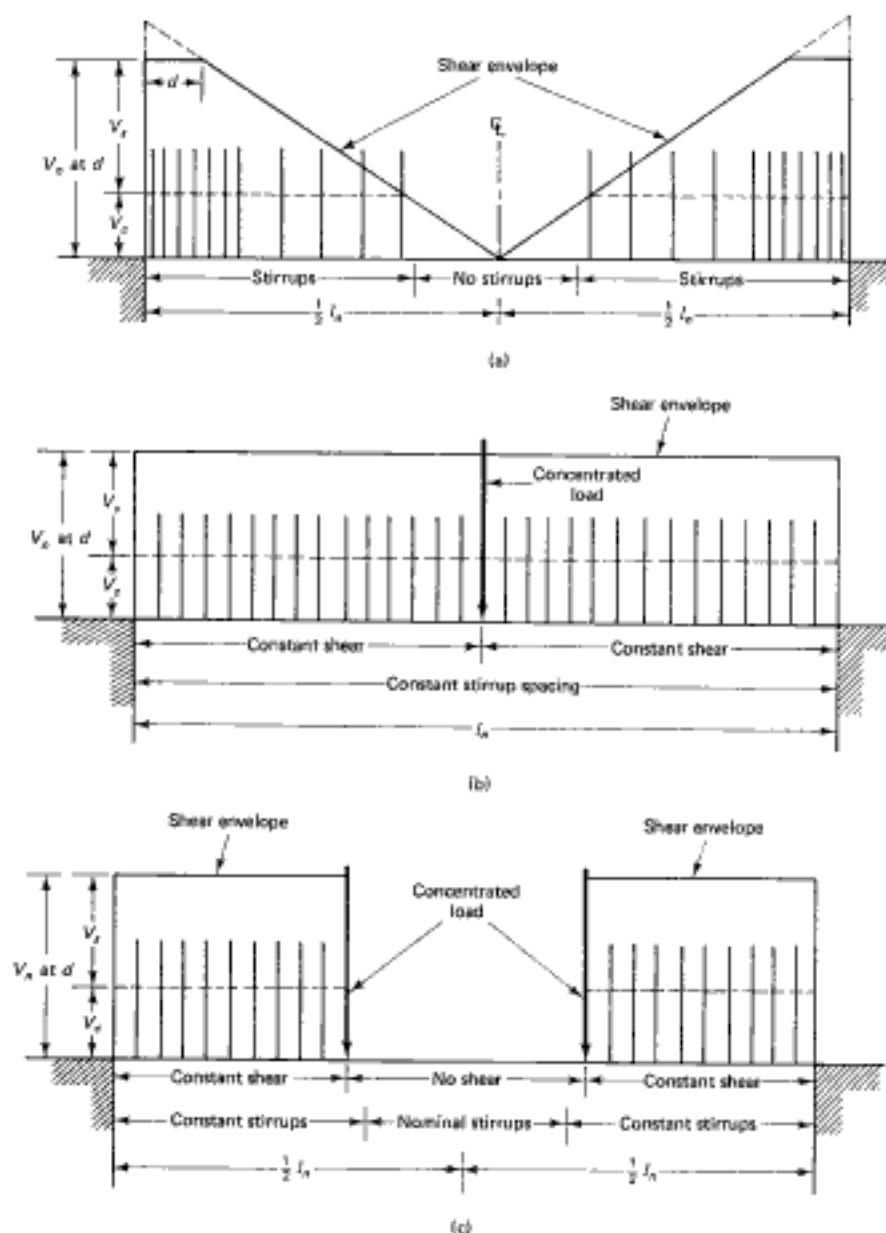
Schematic stirrups distribution: (a) stirrups spacing for uniformly distributed load on beam; (b) stirrups spacing for centrally loaded beam; (c) stirrups spacing for third-point loaded beam. Self-weight is not included in the shear envelope.
